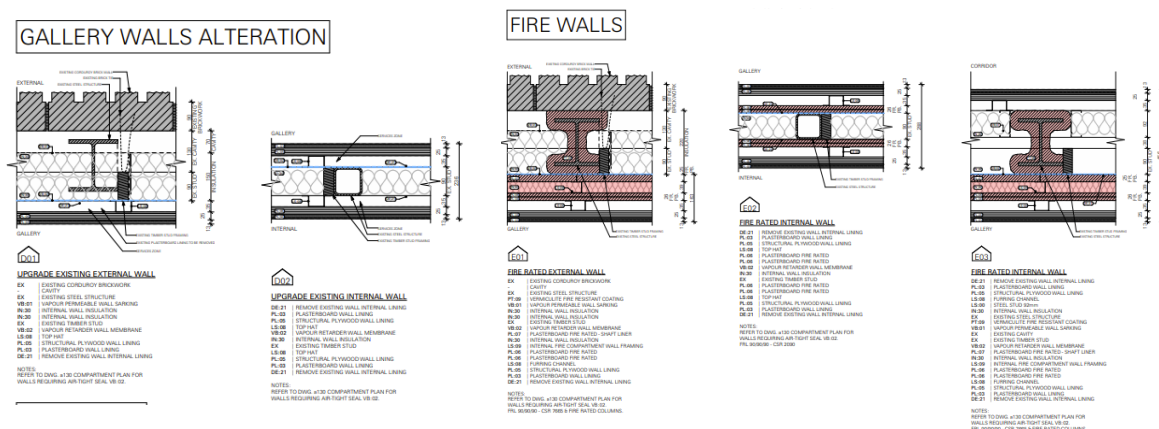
Extract from construction plans show wall alterations. Source: WBa, 2025.
